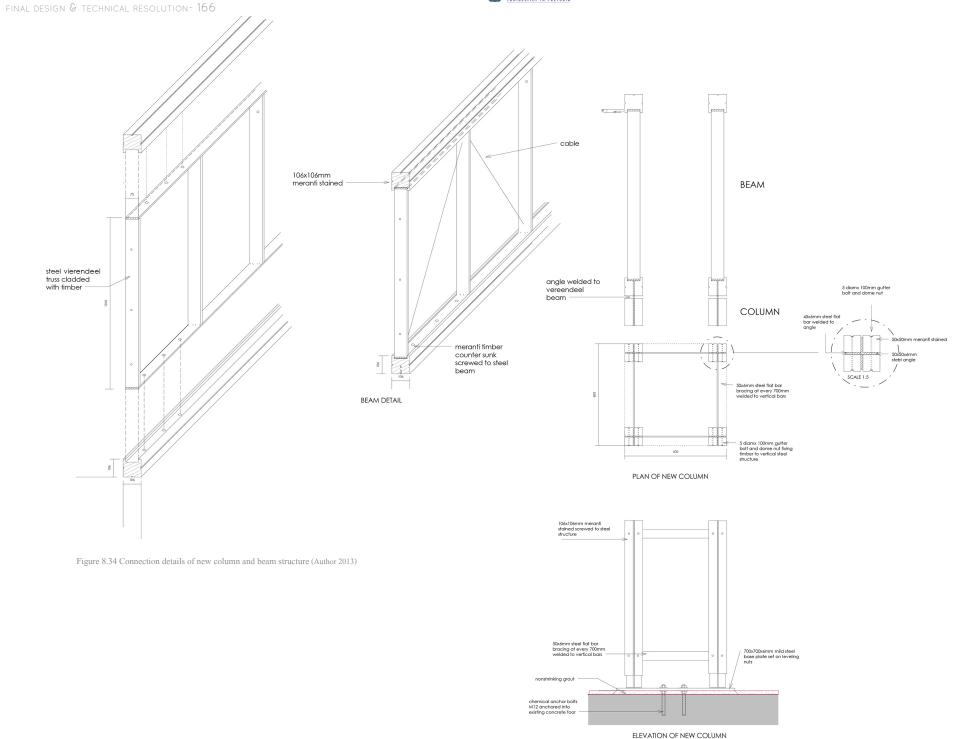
Materials, fixing and details of new column and beam (Author 2013)
